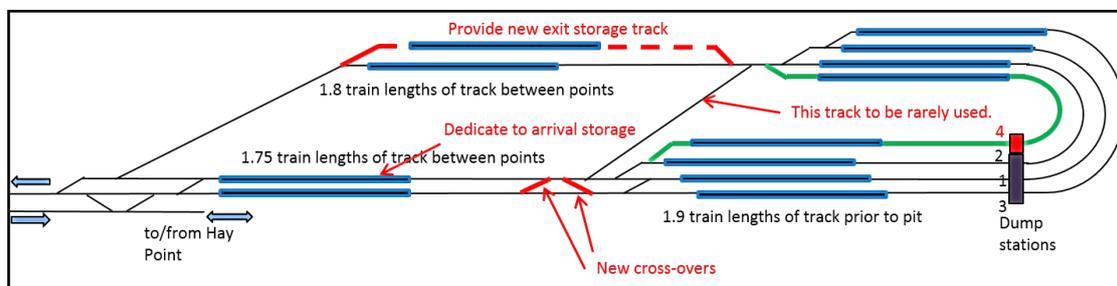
Proposed 8X rail loop modifications shown in red as proposed to be constructed with the IL4 dump station. The fourth rail loop in green would be constructed only at the later 9X stage.
